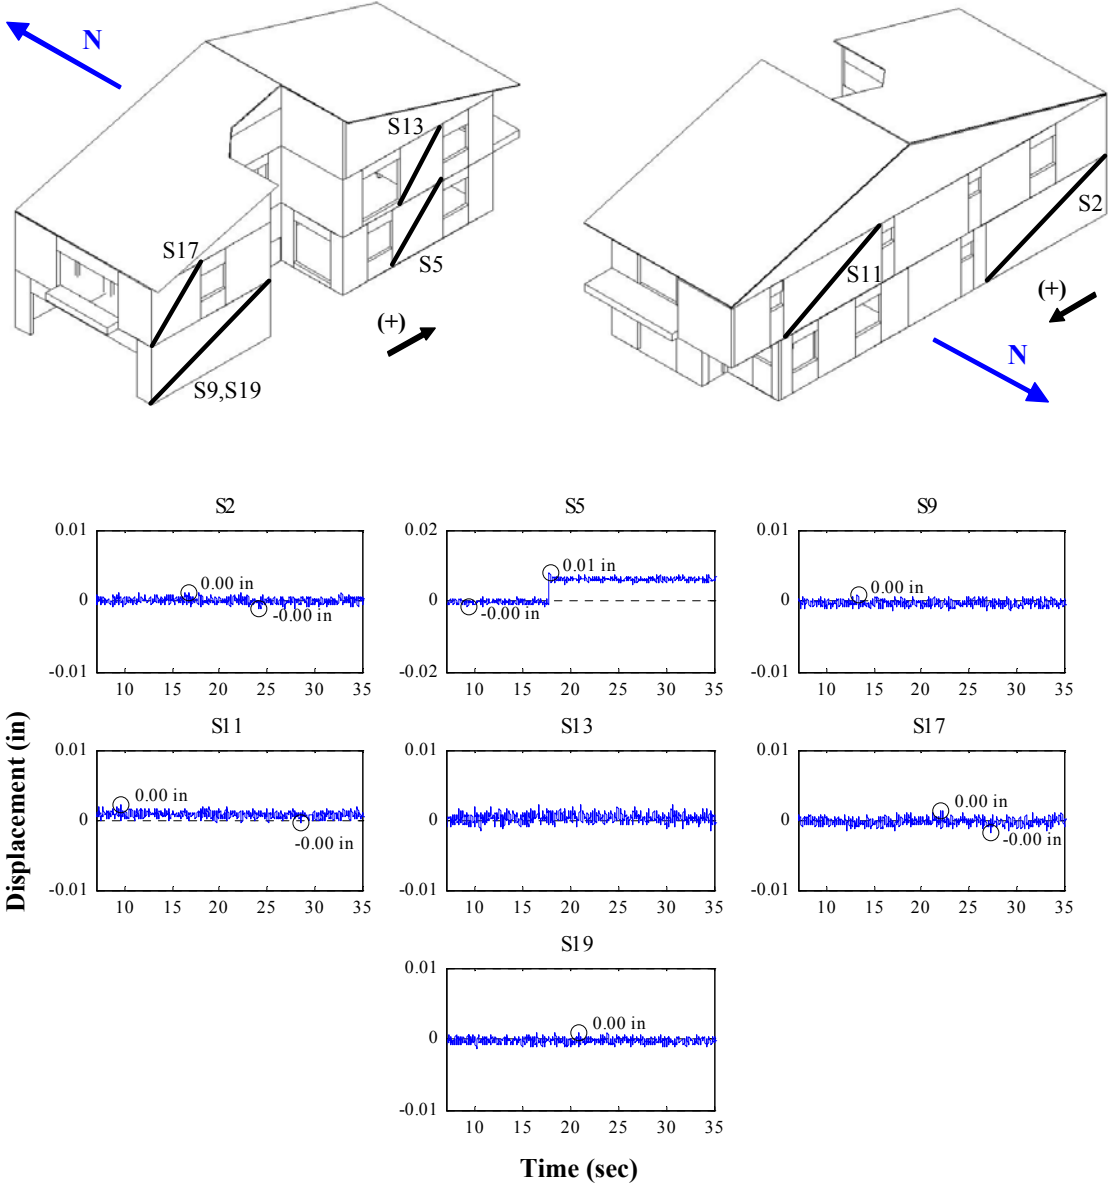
Wall deformations of east-west external walls for Test NWP5S01
